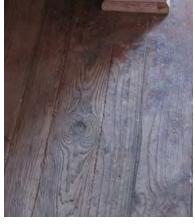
Pine tongue and groove flooring at Room 104. (Photo: BBB, 2006)
